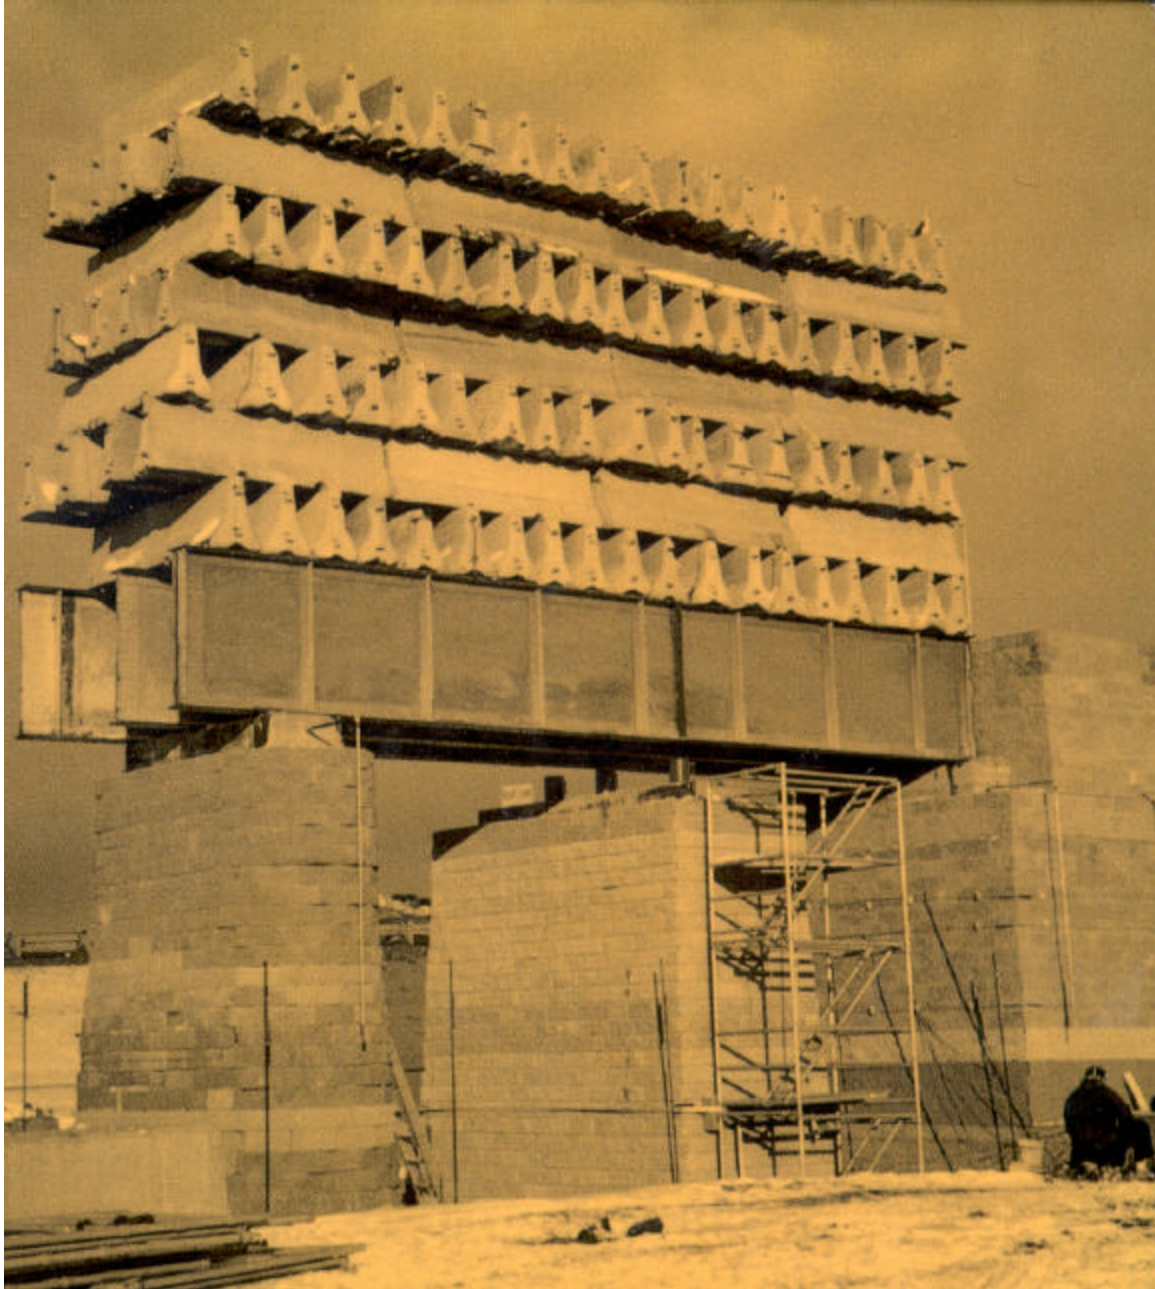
Demonstration Fabric Reinforced Structures at the Havana Maintenance Yard.
